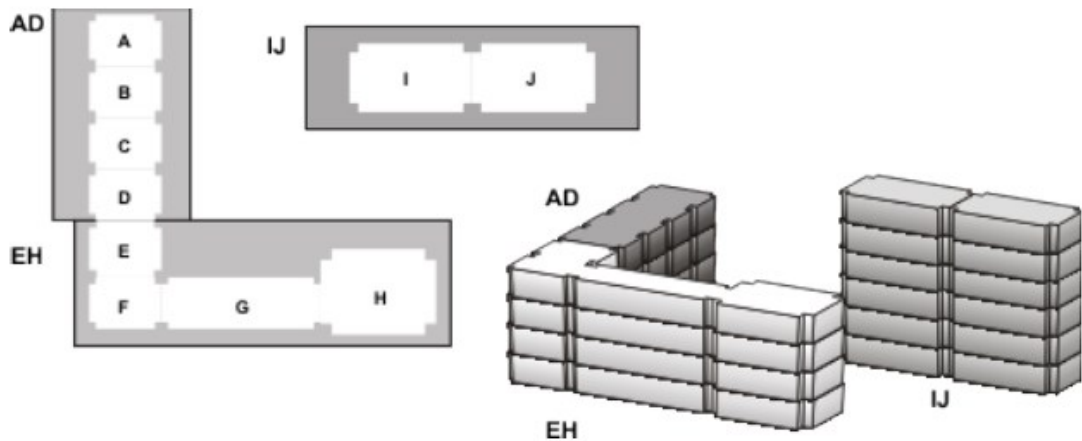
Typical location layout of project (Kenley and Seppänen, 2009b)
